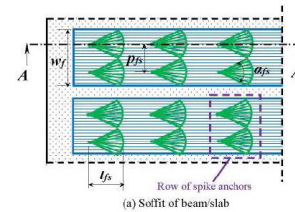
Notation and layout of spike anchors along the flexural reinforcement
